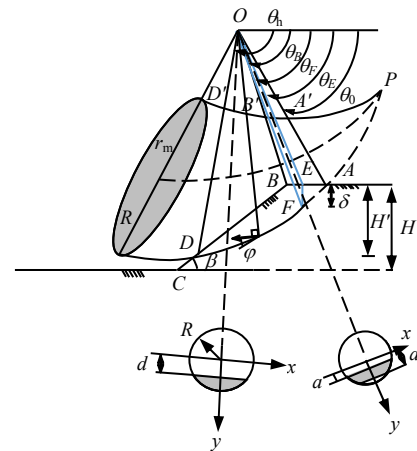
Three-dimensional rotational failure mechanism with crack (with plane insert)
